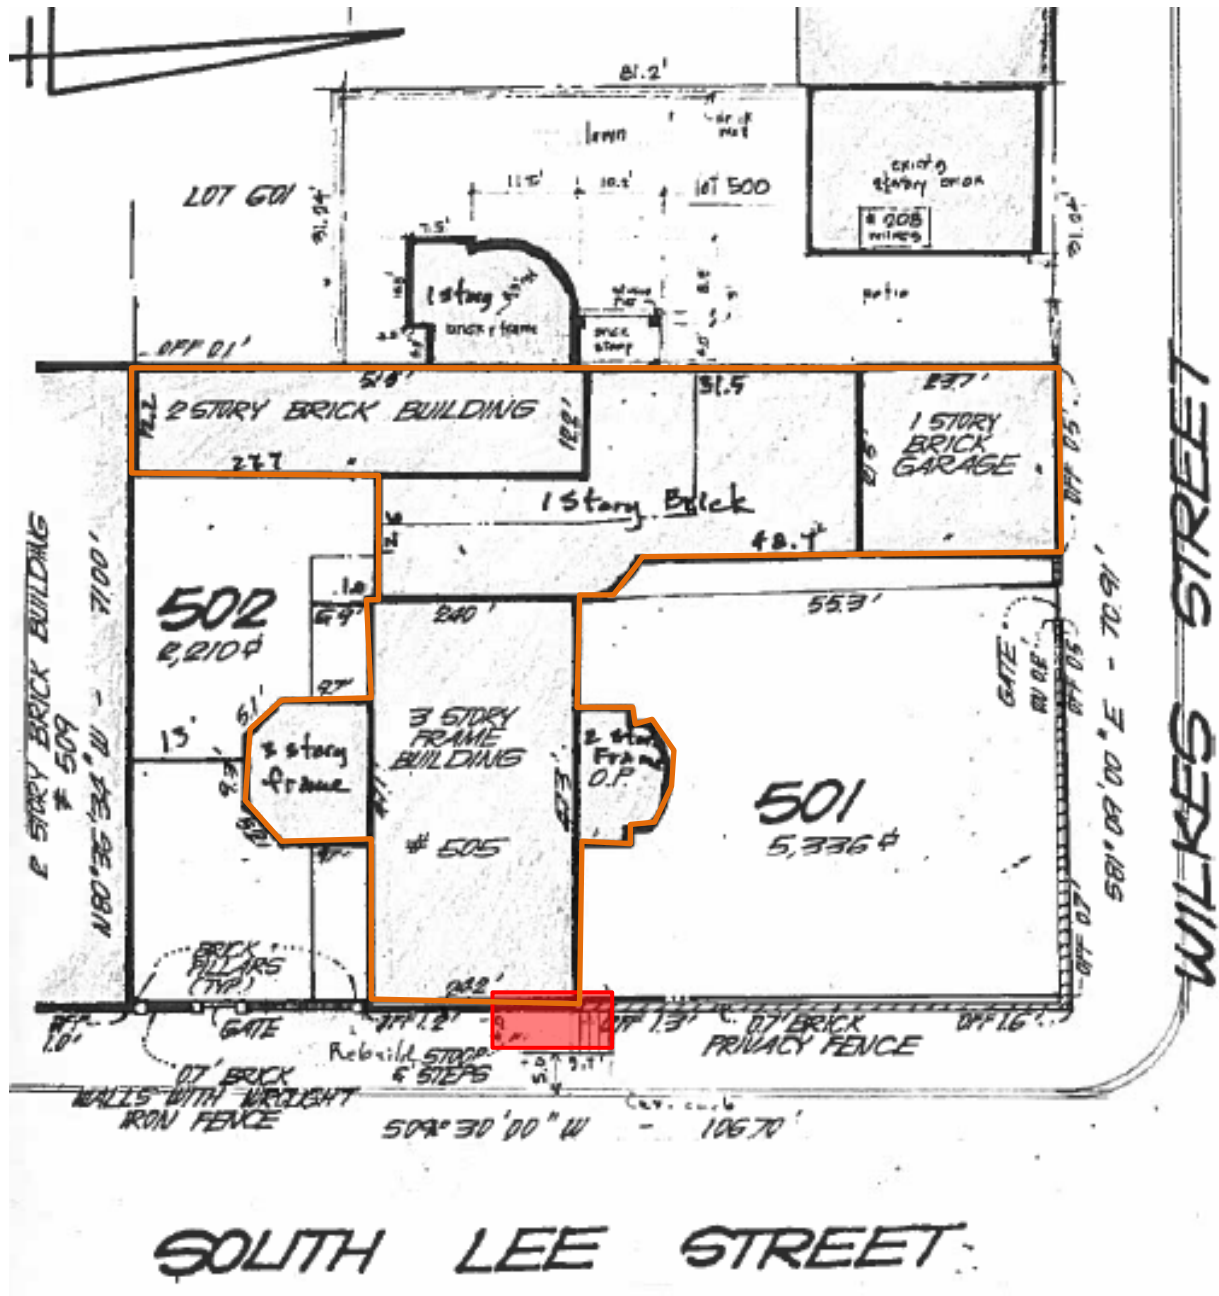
Plat of 505 South Lee Street showing proposed area of encroachment in red and the dwelling outlined in orange.
